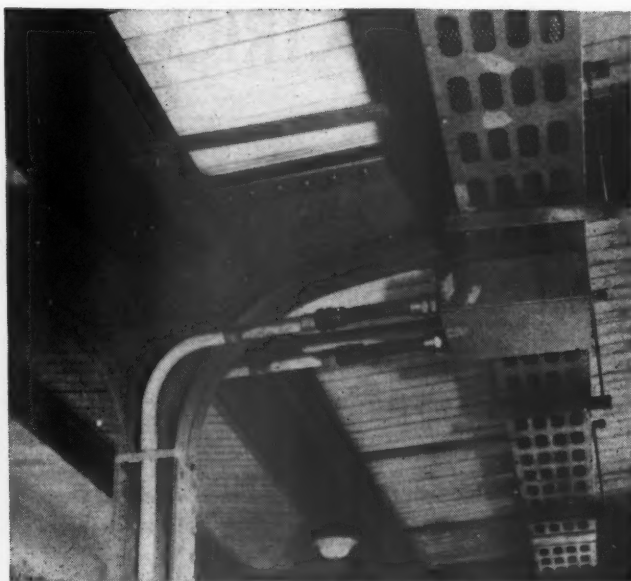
A section of the duct showing a tap box and two branch circuit conduits
